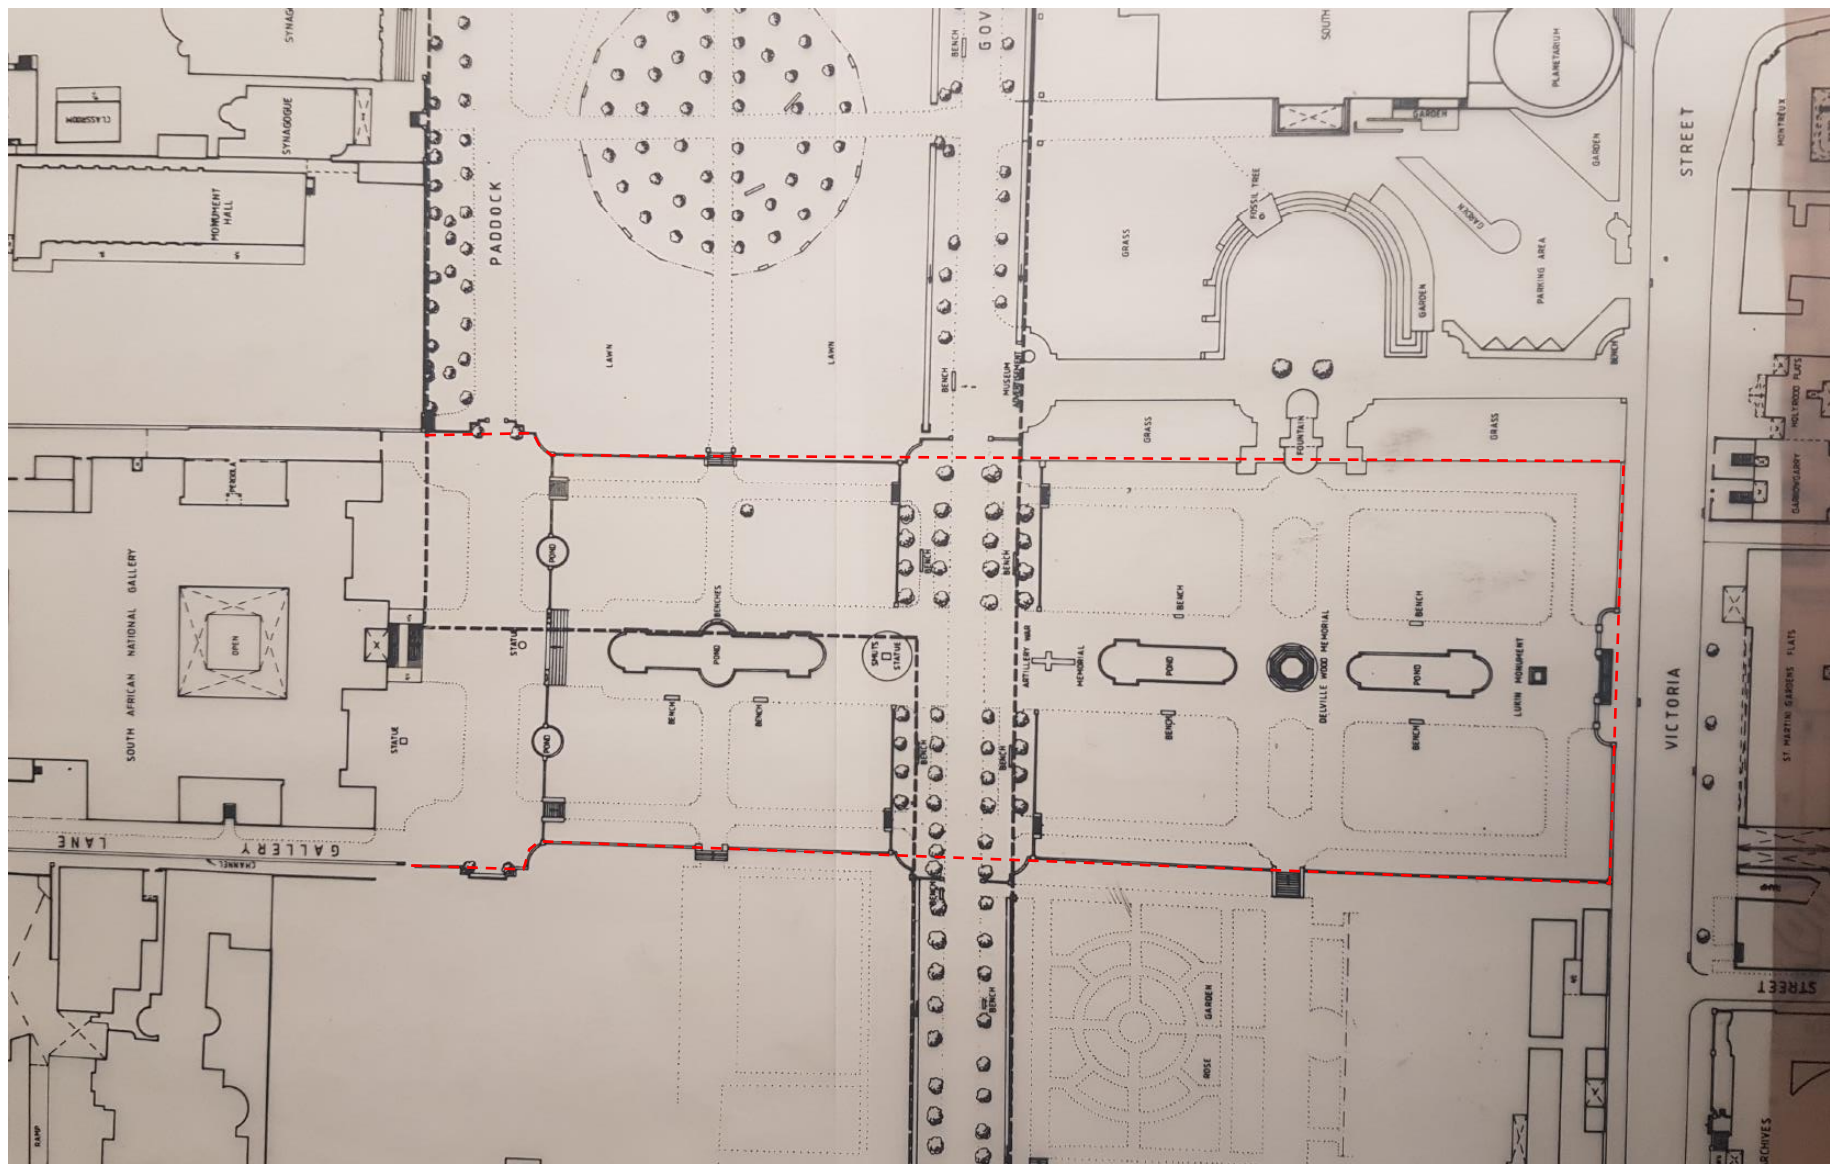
1988 plan of the DWMG which still reflects the garden layout today (CCT plans archives SR285 1:480)
